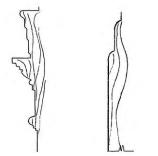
Section profiles of transition from upper to lower pilaster(left). Base profile of pilaster(right).
